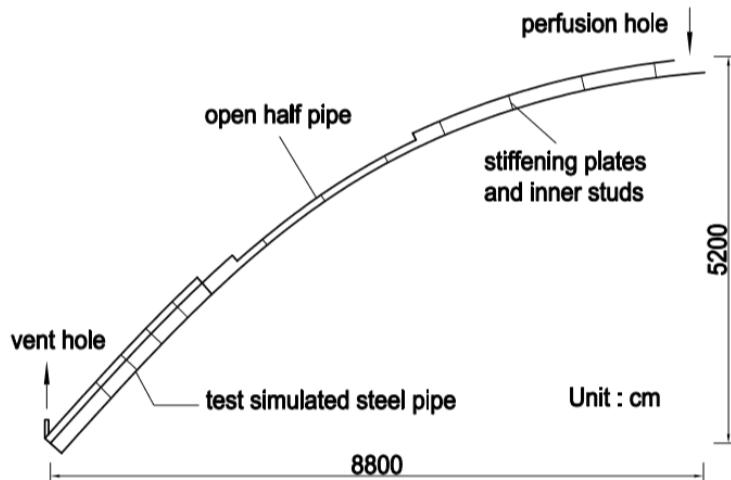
Steel pipe layout diagram of in-site concrete filling simulation test
